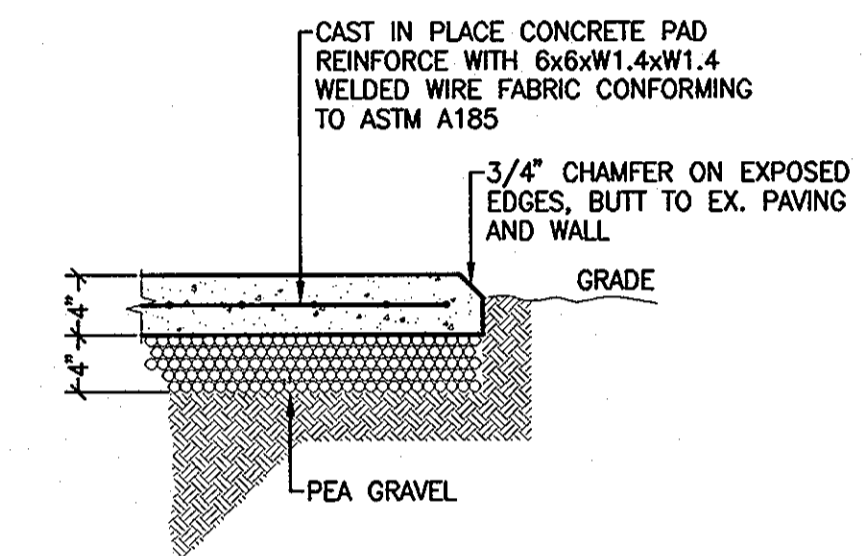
DETAIL - CONCRETE VAULT FUEL OIL STORAGE TANK
